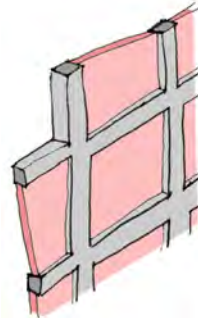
Structure of existing building consists of concrete frame with brick infill, structure is exposed.
